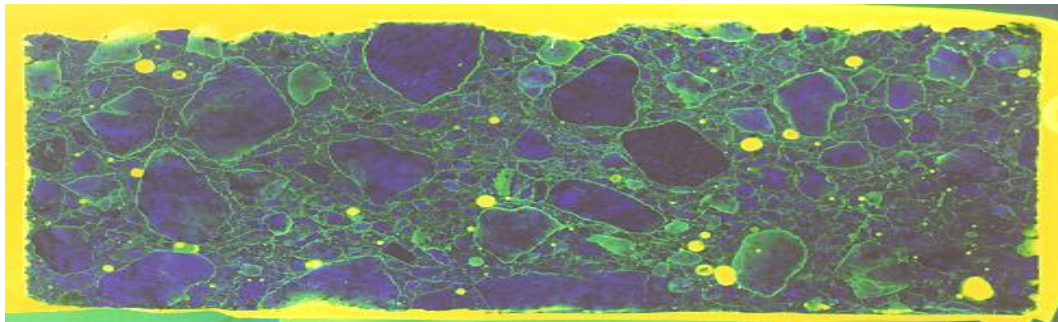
Crack pattern in specimen #1 after 112 cycles. Specimen width: 105 mm. The concrete has been impregnated with fluorescent epoxy in order to see the cracks.
